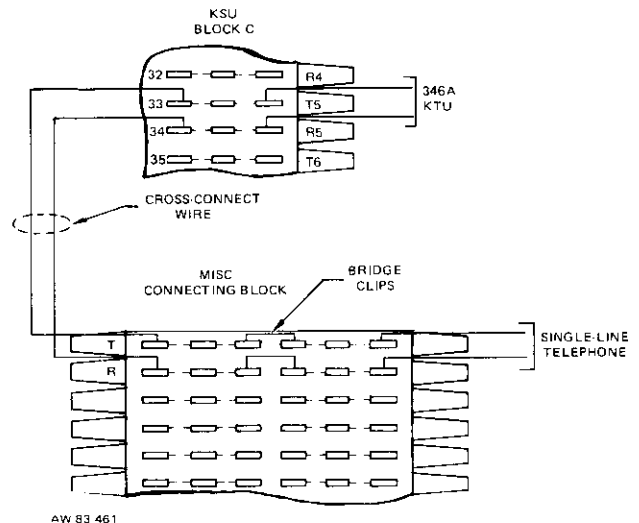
Connecting Details, 346A KTU to Single-Line Station
